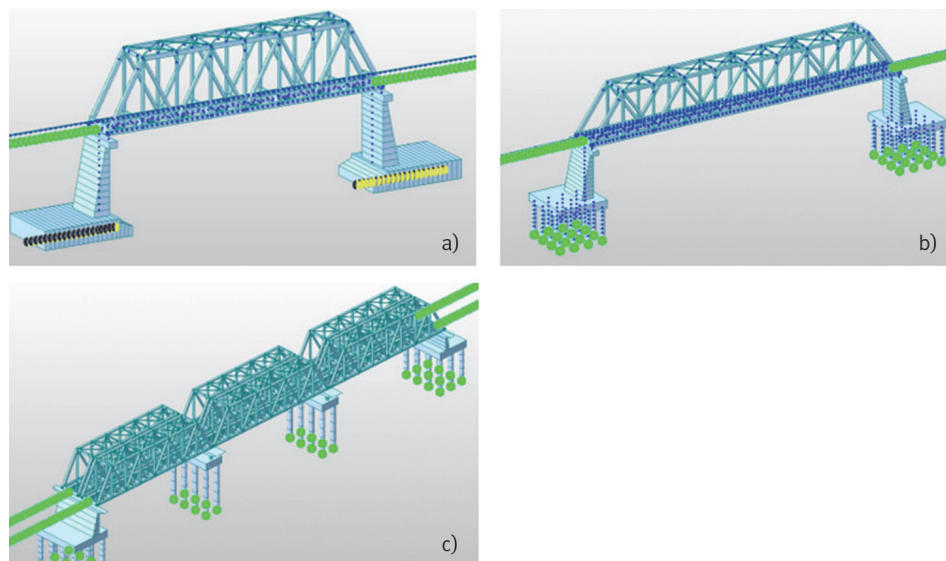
Rendered Superstructure Model for: a) Bridge 1, b) Bridge 2 and (c) Bridge 3
